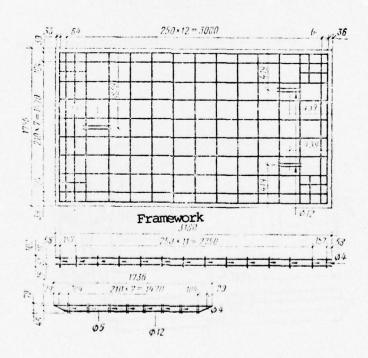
Reinforcement of a slab, intended for laying in track-spacing
